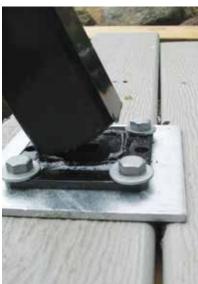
The UltiMount ProSpec kit comes with a galvanized surface plate and bottom plate, plumb adjusting bolts and nut plate, and a post-sleeve spacer and skirt (left). Not included are 5/16-inch-diameter mounting bolts. While the reinforcing plates prevent the bolts from pulling through or splitting the blocks, the weld between the thin-wall steel post and the plate snapped at a little over 350 lb. (above).
